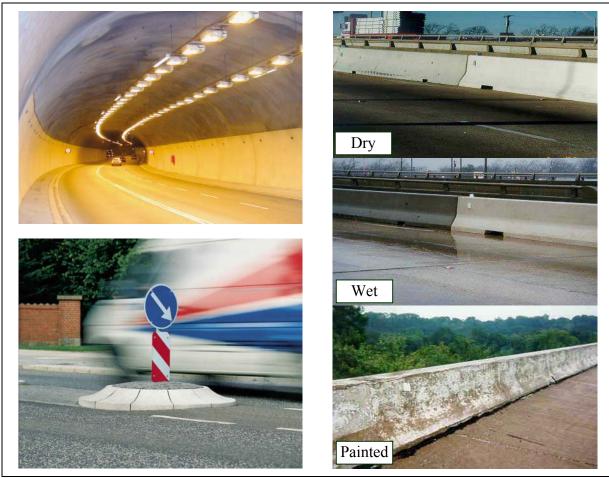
Above left: Tunnel lined with white concrete, Norway.
